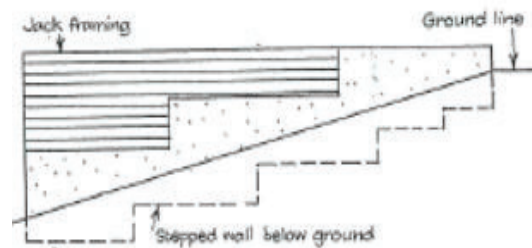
Commonly used subfloor foundation options (pre 1978) [1]
